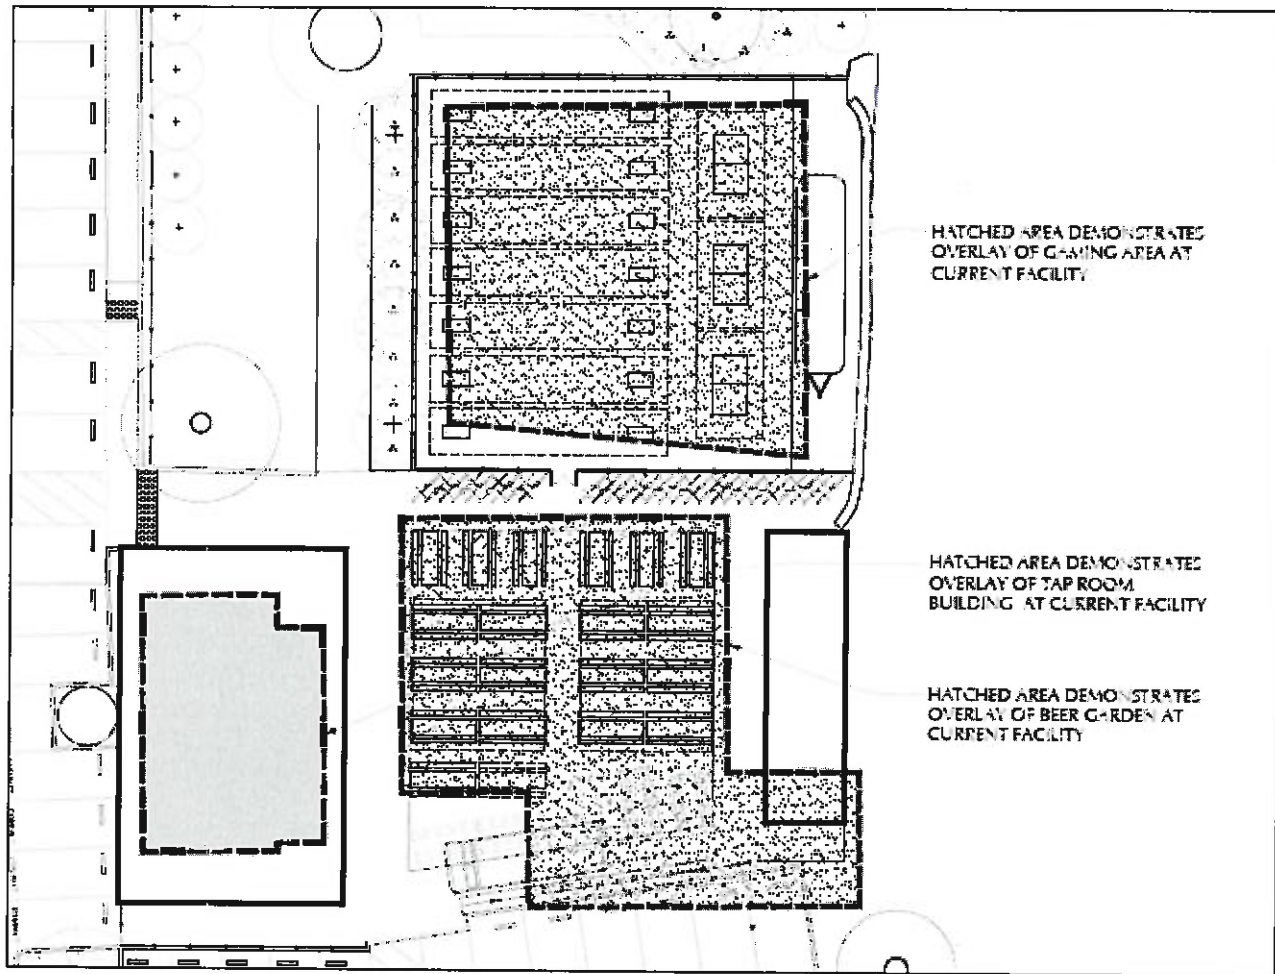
This exhibit shows the existing Beer Thirty's use area overlaid on the new location's site plan (Source: William Kempf, architect)
